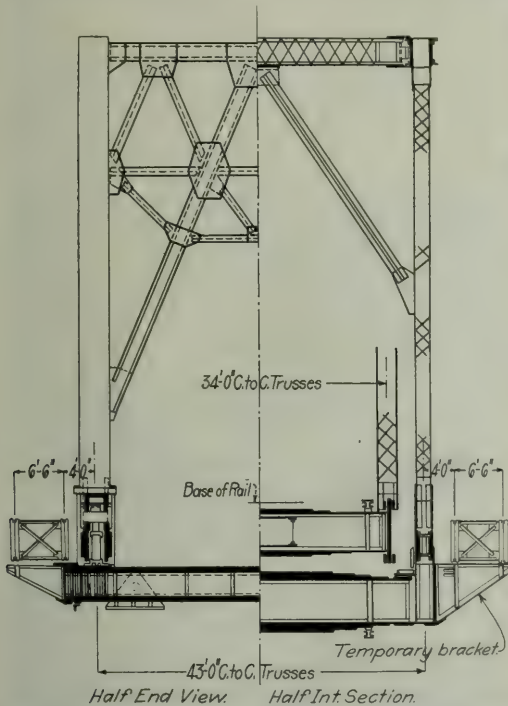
Elevation and Section Showing Relation of New Bridge to Old and the Temporary Material Tracks Outside of Trusses.
